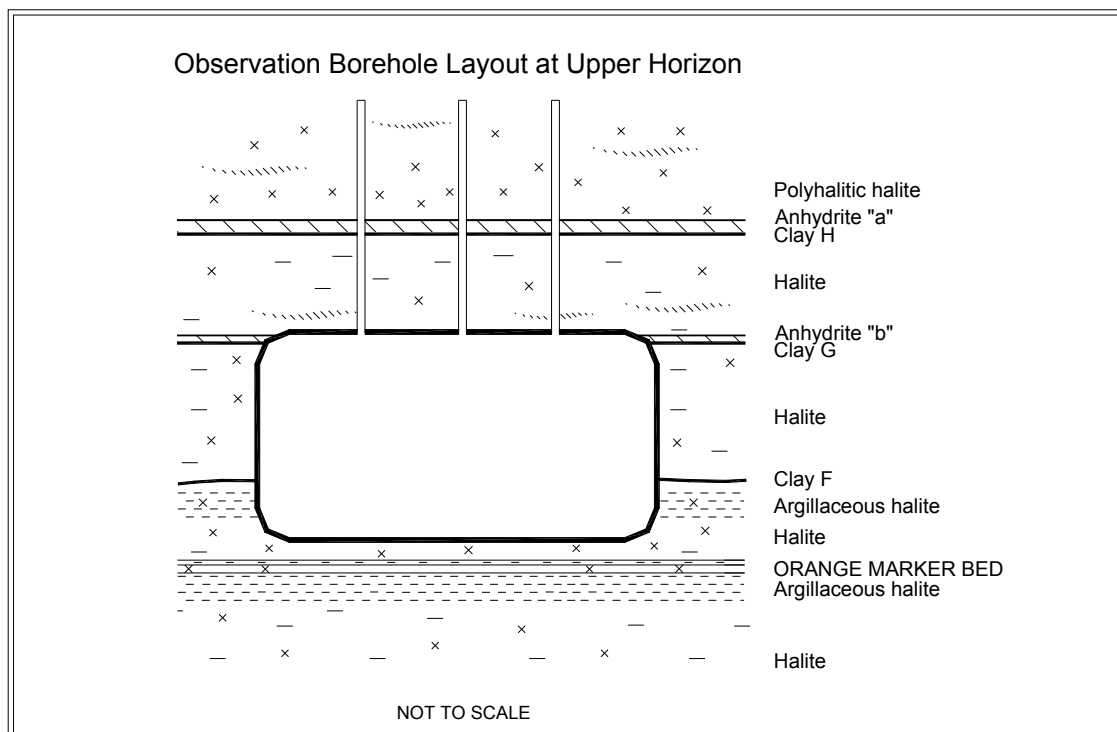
Example Observation Hole Layout at Upper Horizon
